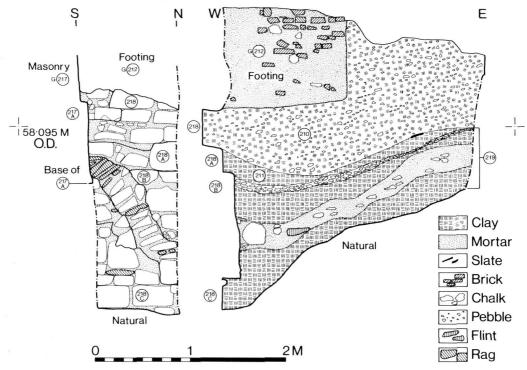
Eltham Palace: Elevation of strainer arch in Bishop Bek's perimeter wall and section through layers against this wall.
